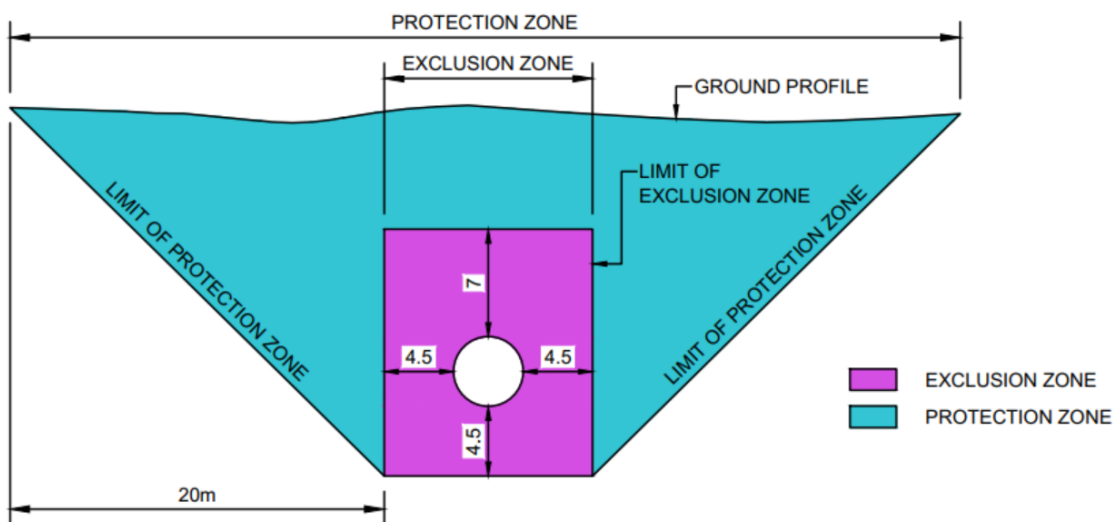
Exclusion and Protection Zones for Belfast Stormwater Tunnel 4.05 m Tunnel
